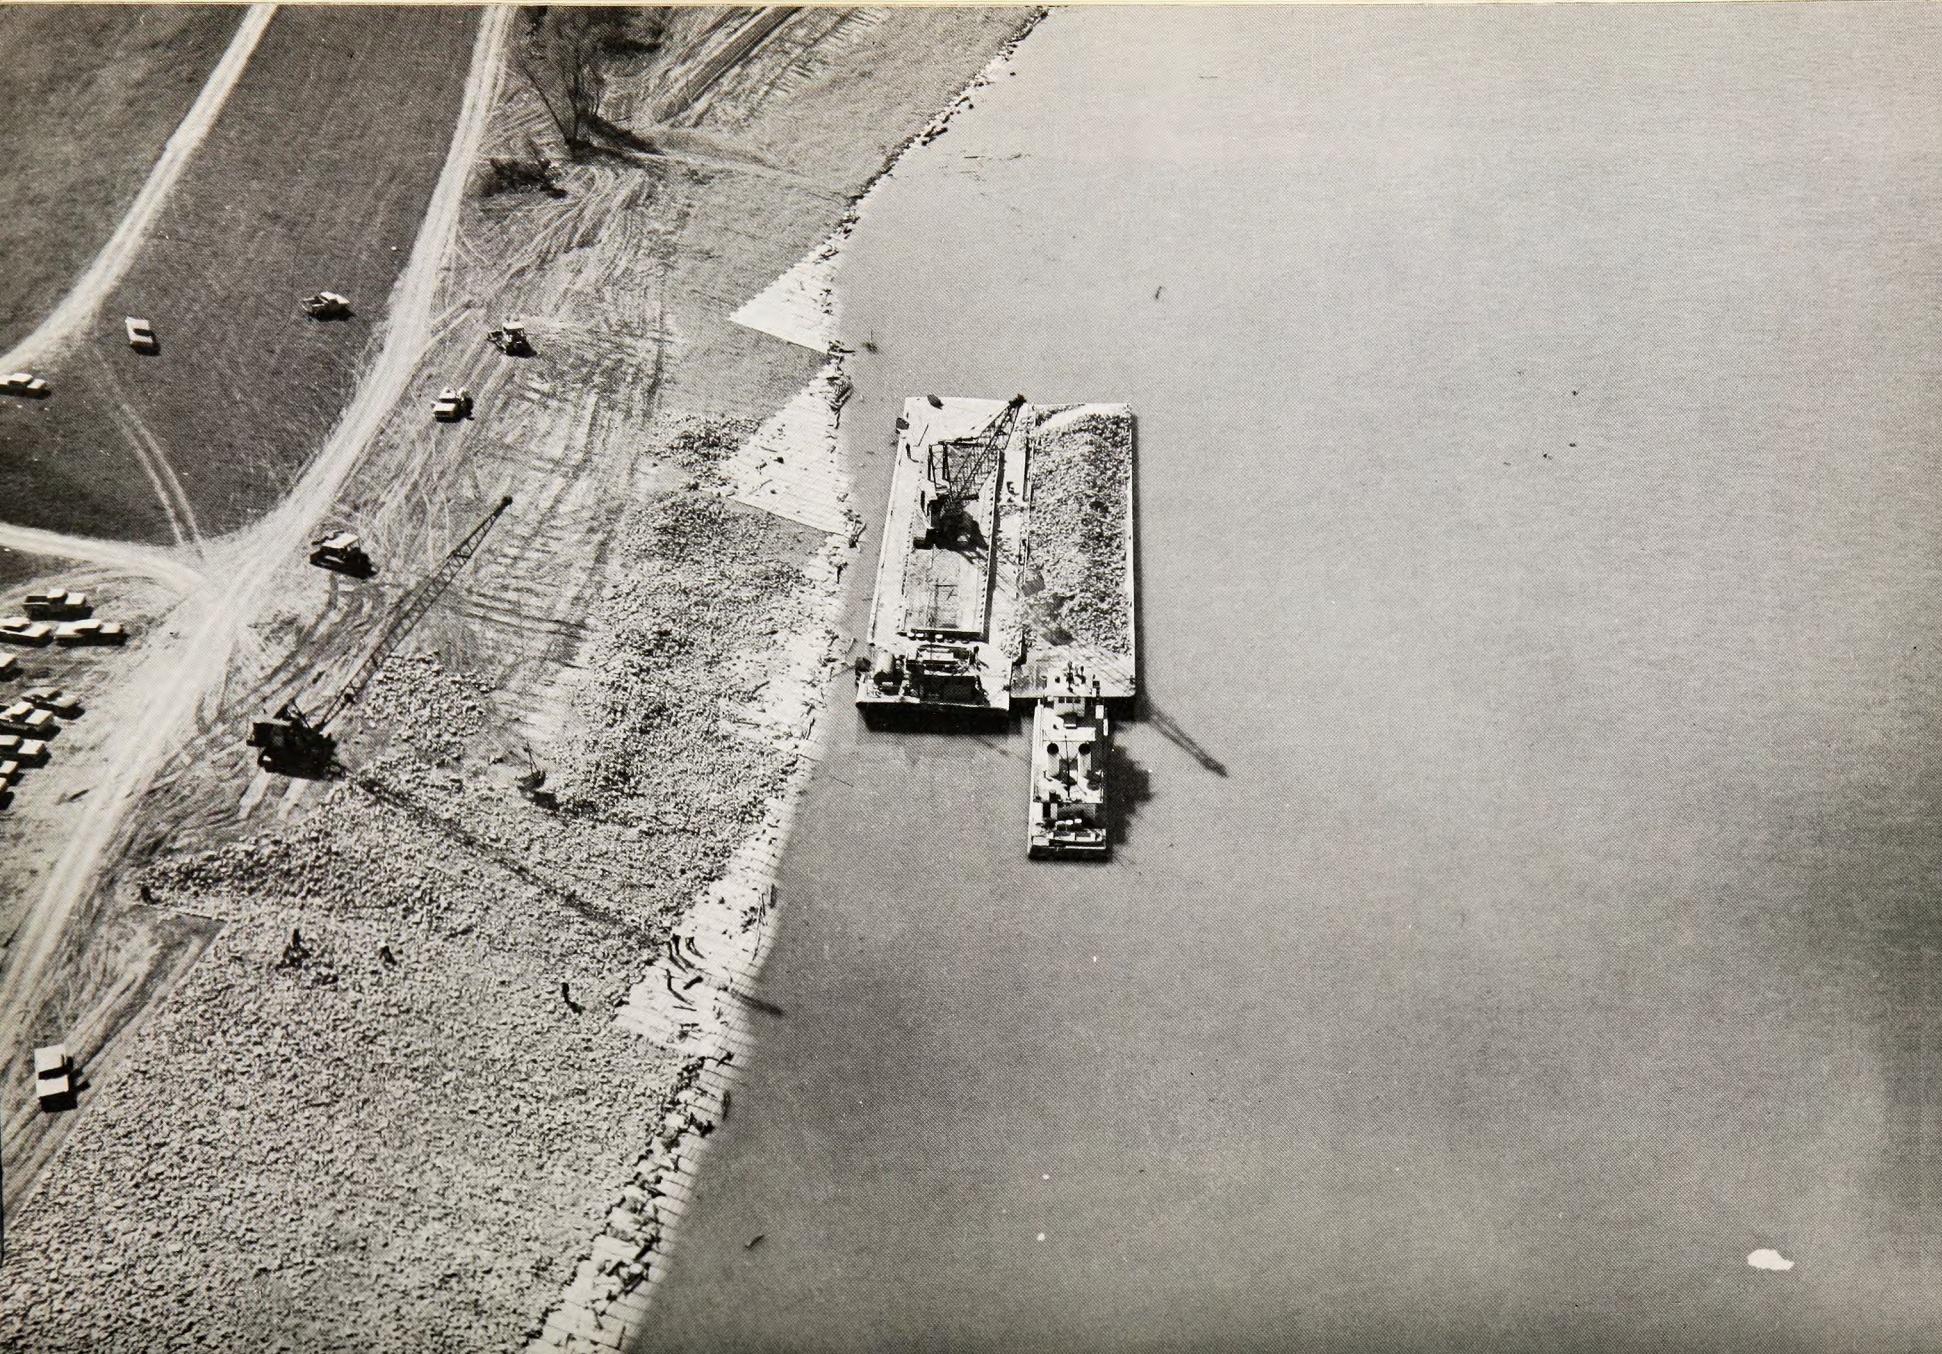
Bank protection — new style. Riprap (broken stone) is laid to overlap the articulated concrete mats.
